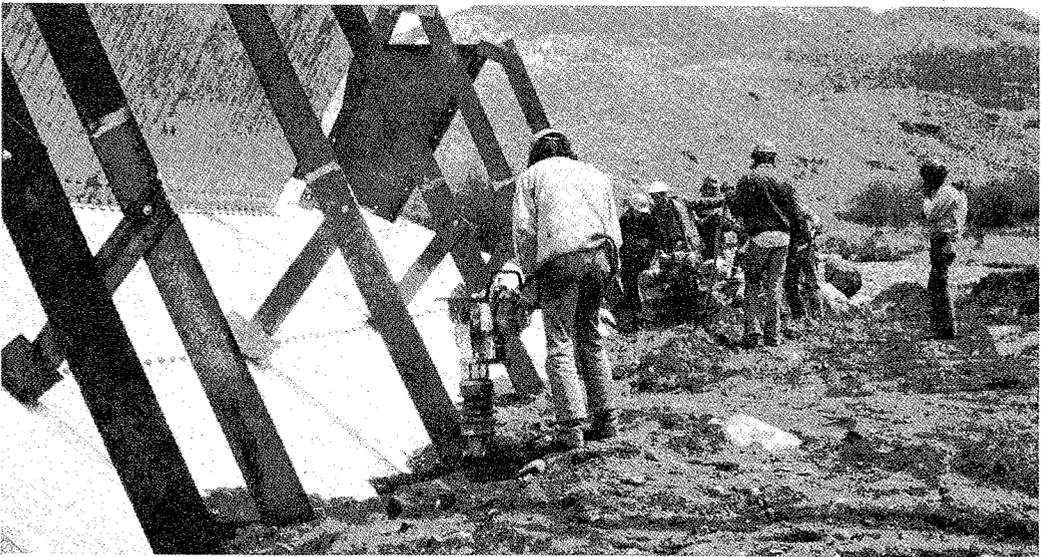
Stiffeners added as a safety factor to stiffen the structure during backfilling. Backfill lifts alternate from side to side, and are placed in approximately one foot lifts.
